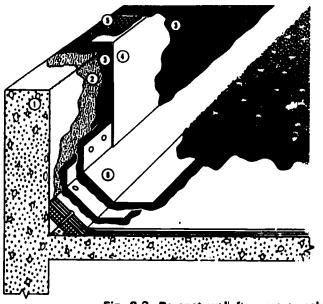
Five-course plastic flashing for concrete walls more than 18 inches (45.7 centimetres) high
